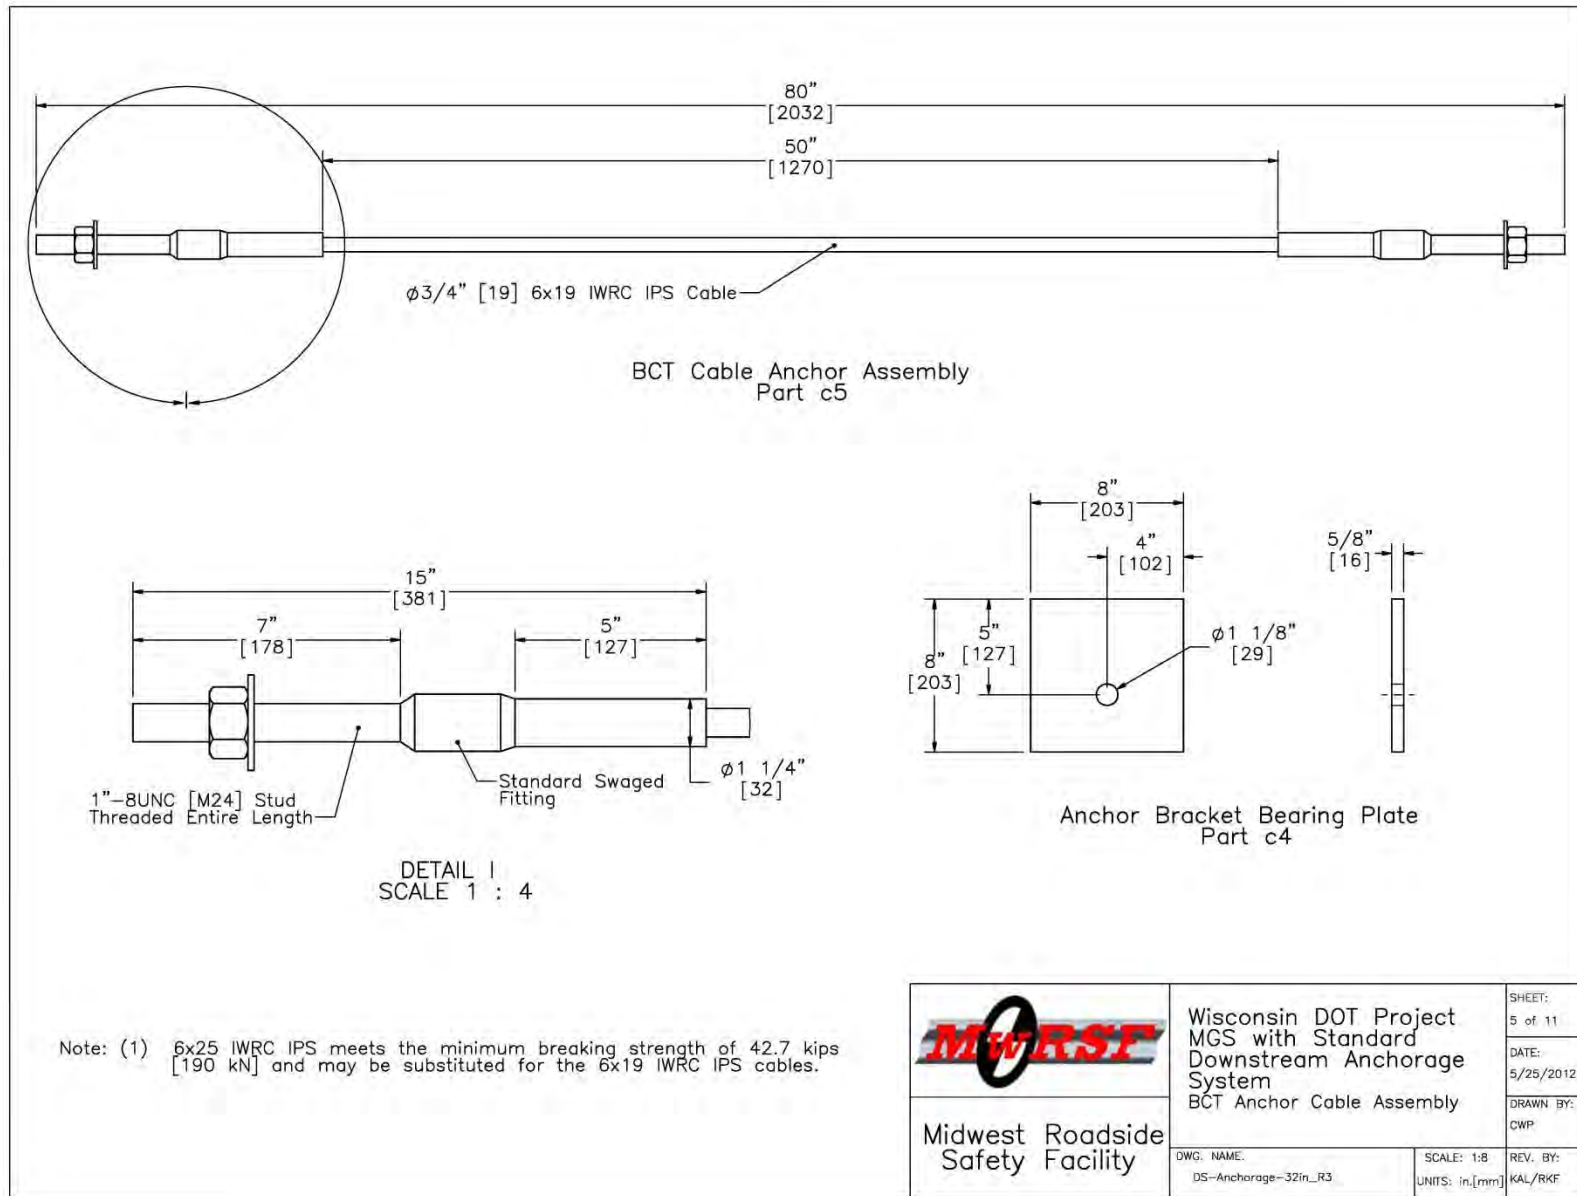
BCT Anchor Cable Details, Test No. WIDA-2
